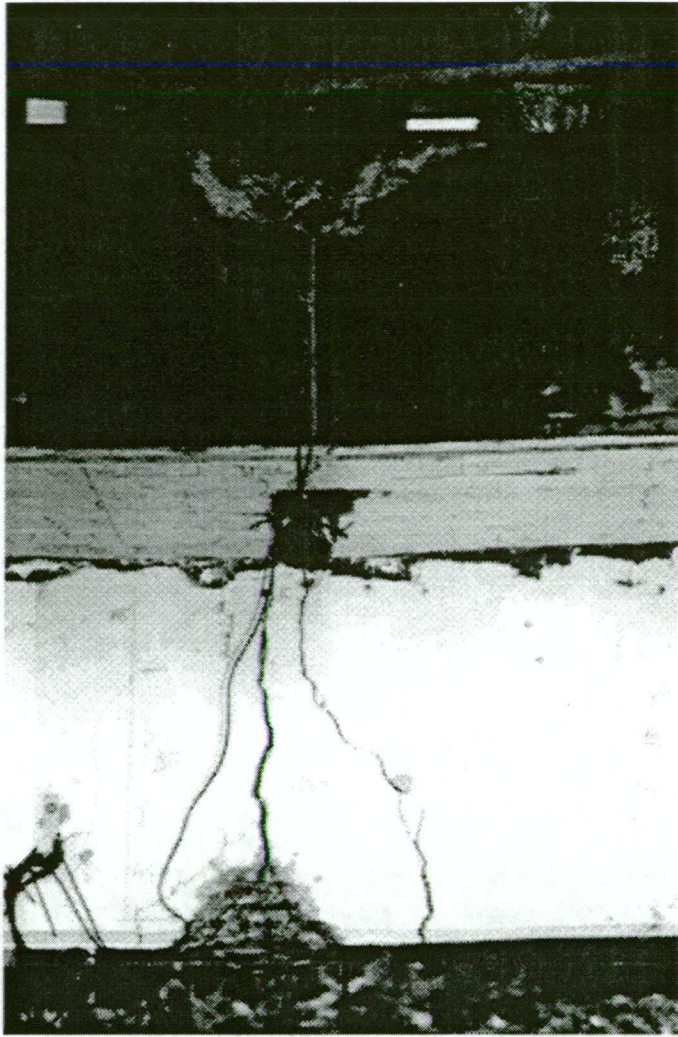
Cracking of Upstream Beam at Ultimate Load
